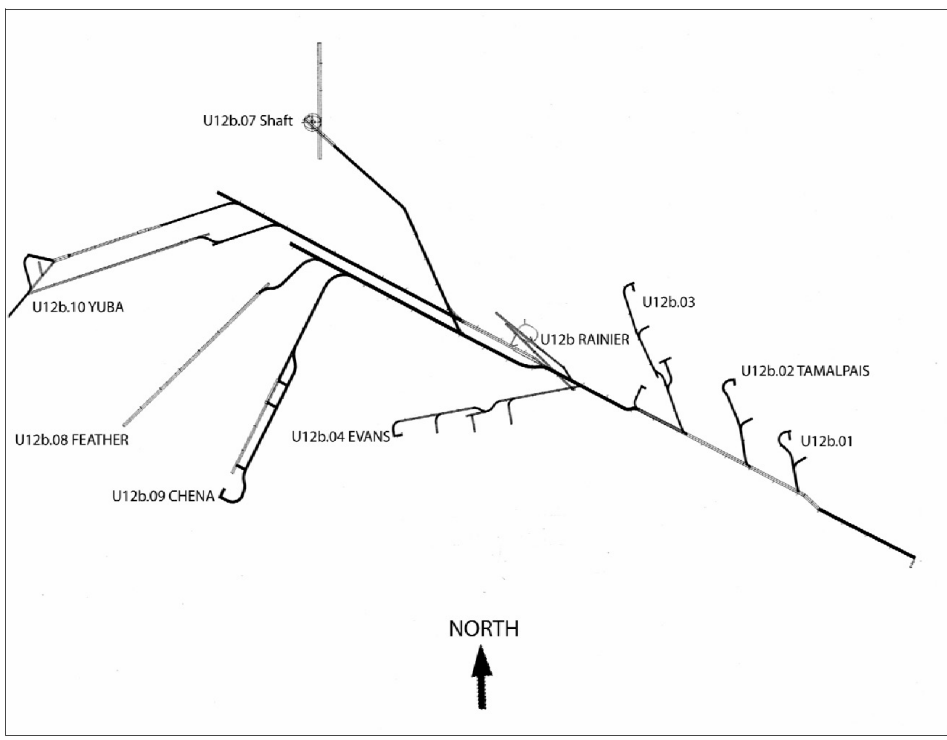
Location of Yuba in U12b.10 in the B tunnel complex.
